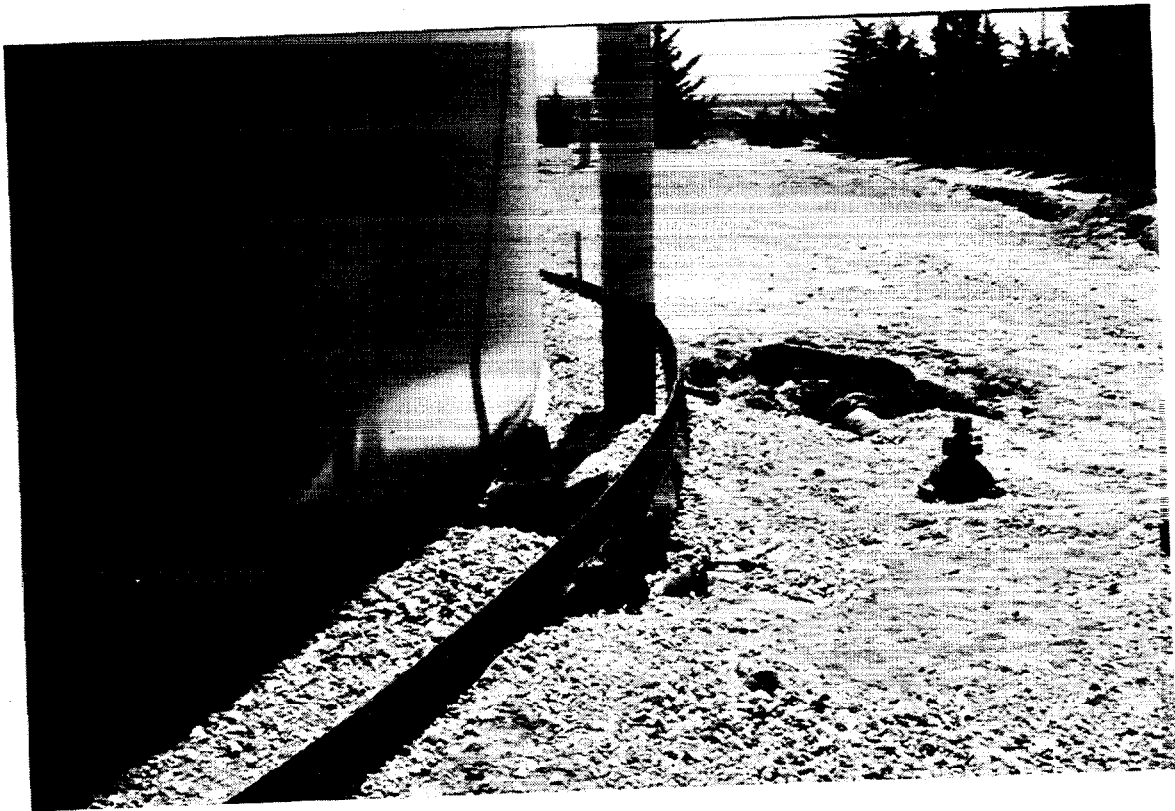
Tank A, riser pulled piping and rock retainer ring out of the ground.
